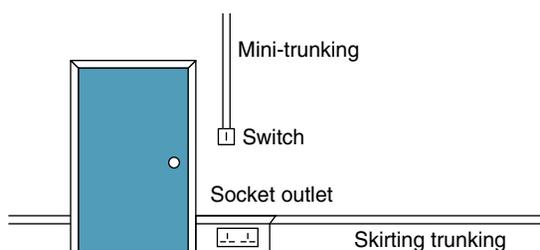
Typical installation of skirting trunking and mini-trunking.
